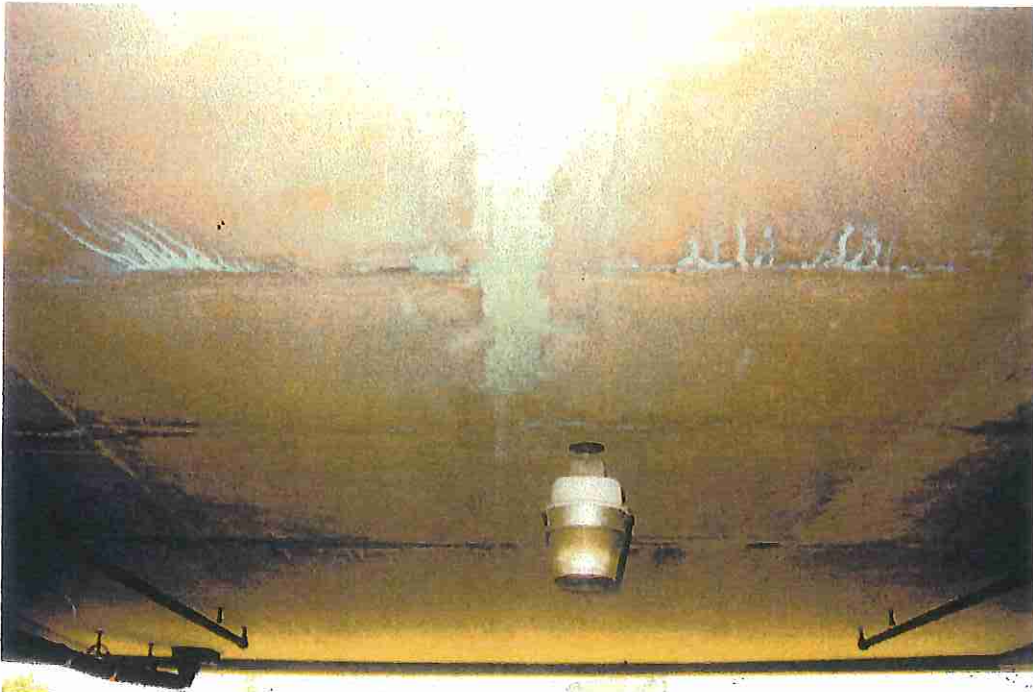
Soffit of external garage showing chloride deposits. Occurs more on the west end at the bottom of ramps.
